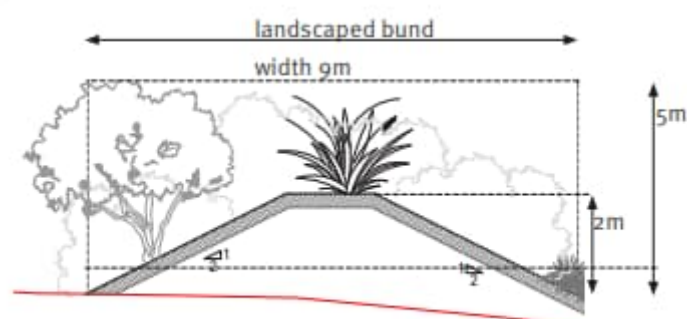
SECTION B: Typical cross-section of landscaped earth bund (NTS)
